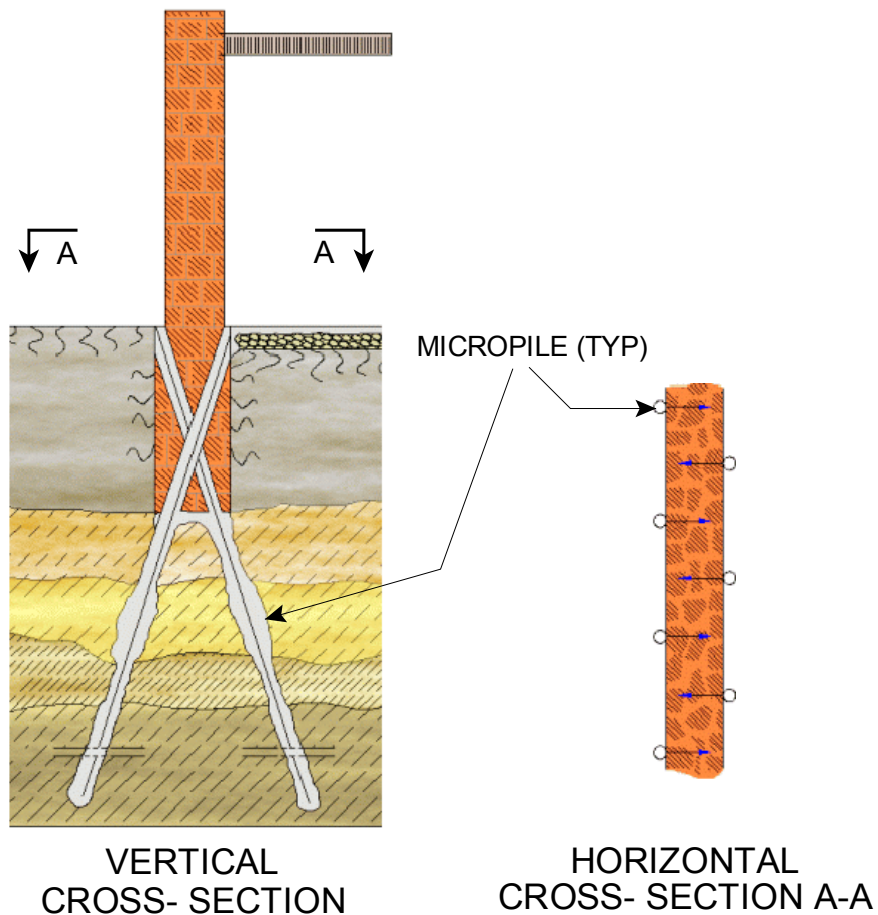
Arrangement of Root Piles (*pali radice*) for Underpinning.
